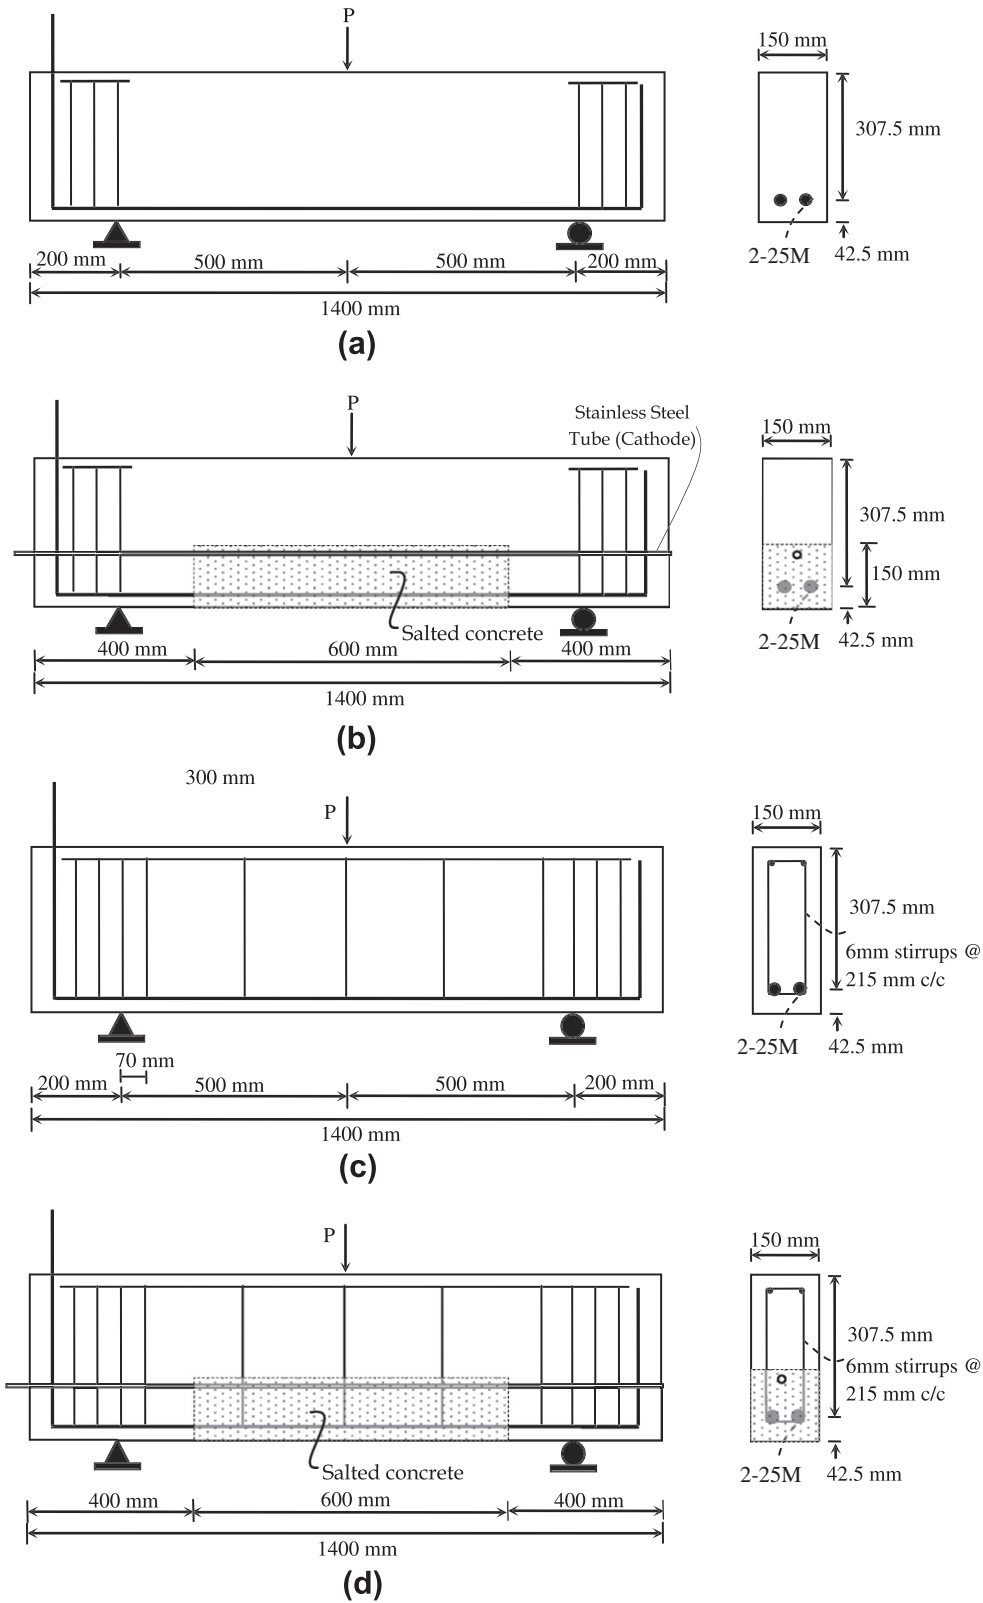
Details of specimens (a) control beam without stirrups, (b) corroded beam without stirrups, (c) control beam with stirrups and (d) corroded beam with stirrups.
